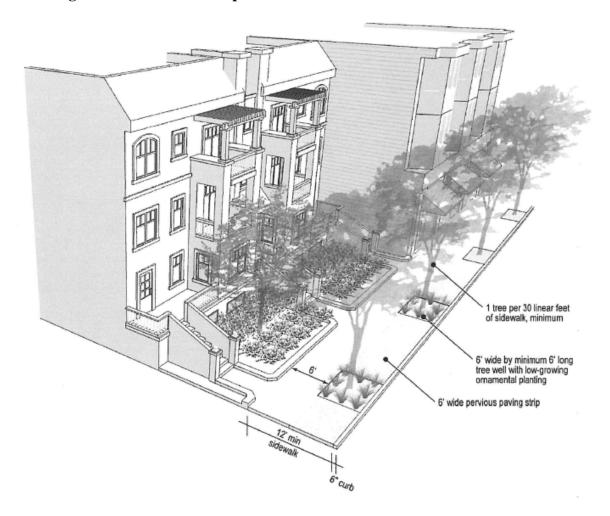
Streetscape Standards – Residential Ground Floor Uses
